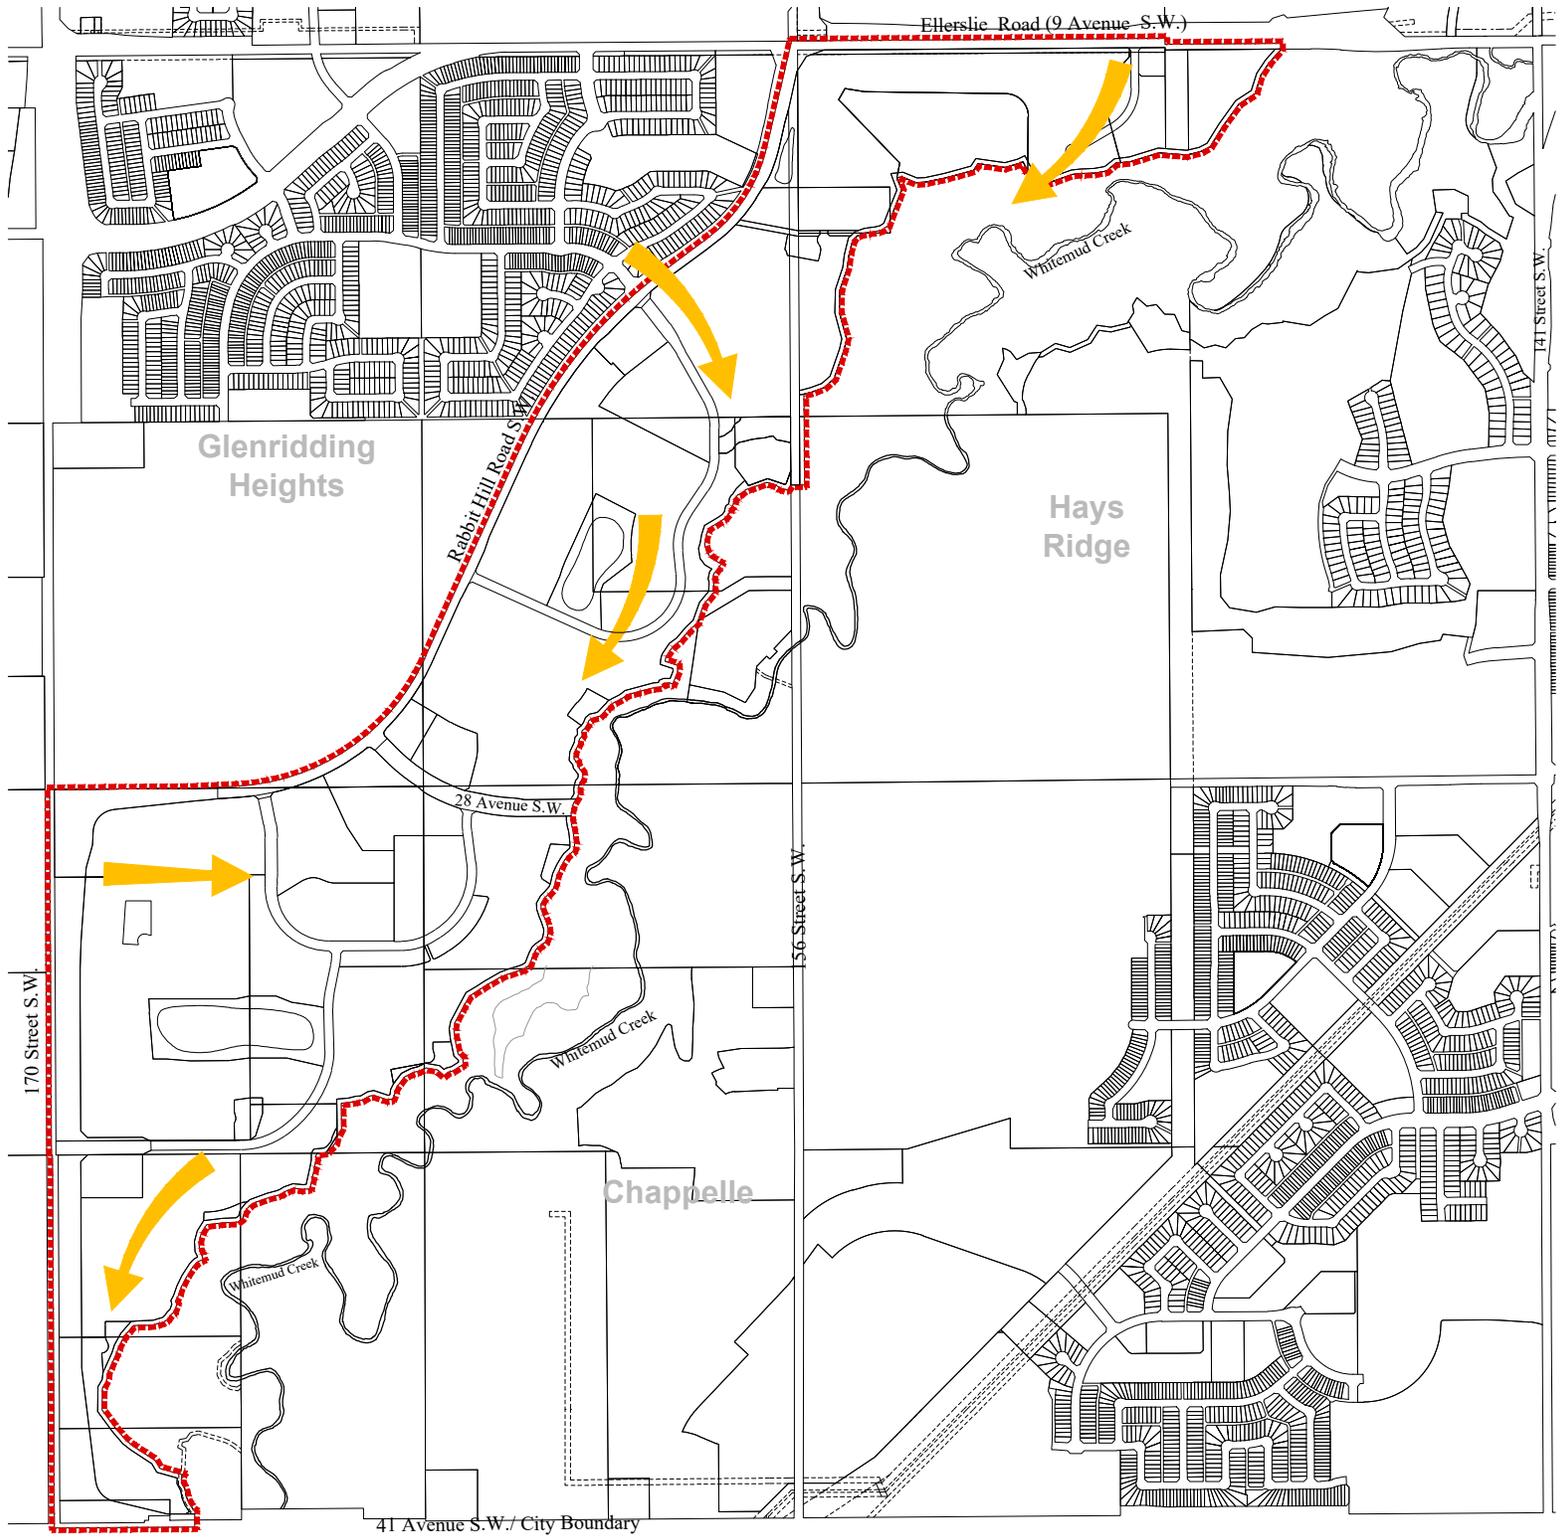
Water Servicing Plan Glenridding Ravine - Neighbourhood Structure Plan
